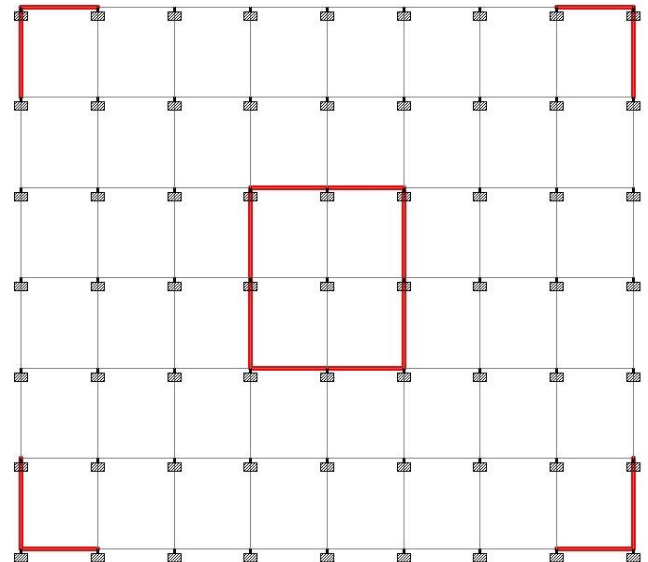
Location of Struts (Single Cross-Strut) in Plan.
